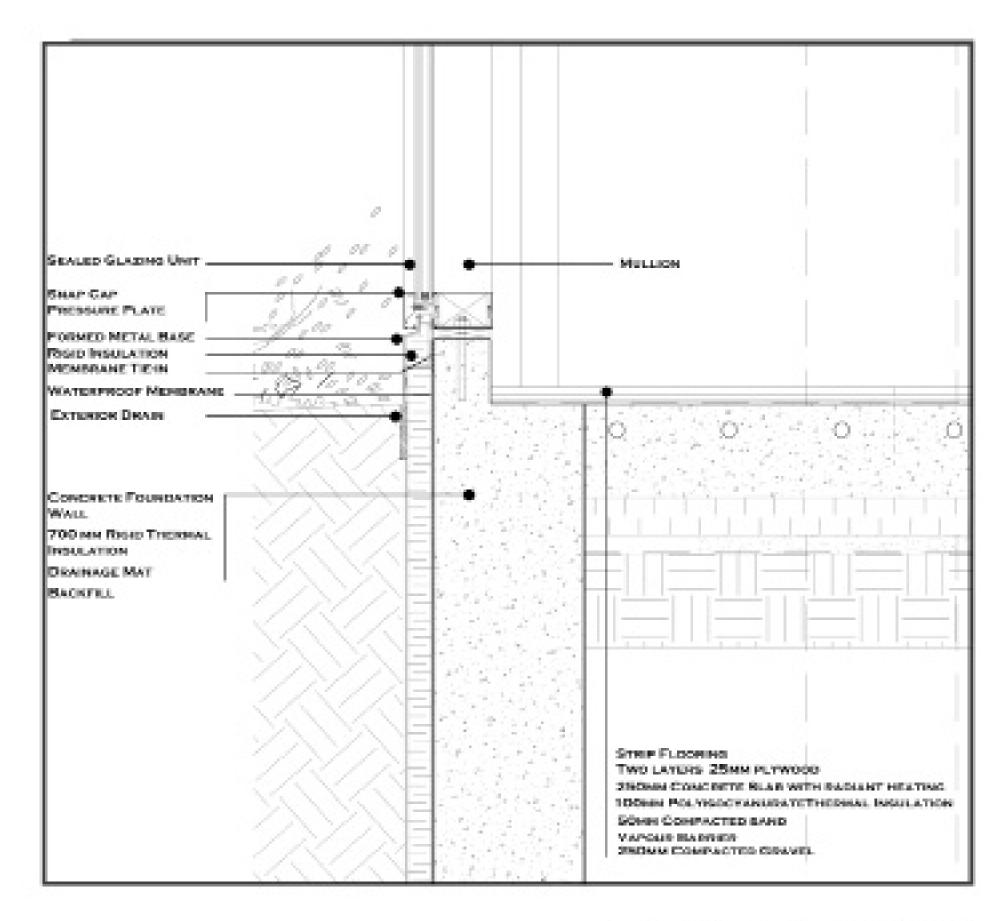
GLASS BOX CONNECTION DETAIL
